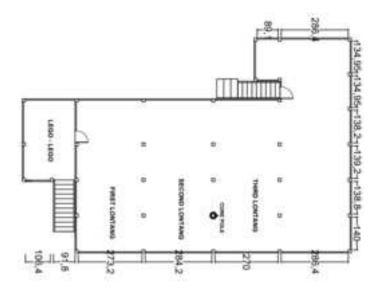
Floor plan of an old style house for a commoner (four latte main house, one latte tamping and four lontang). Source :Sketch of field survey 2015
